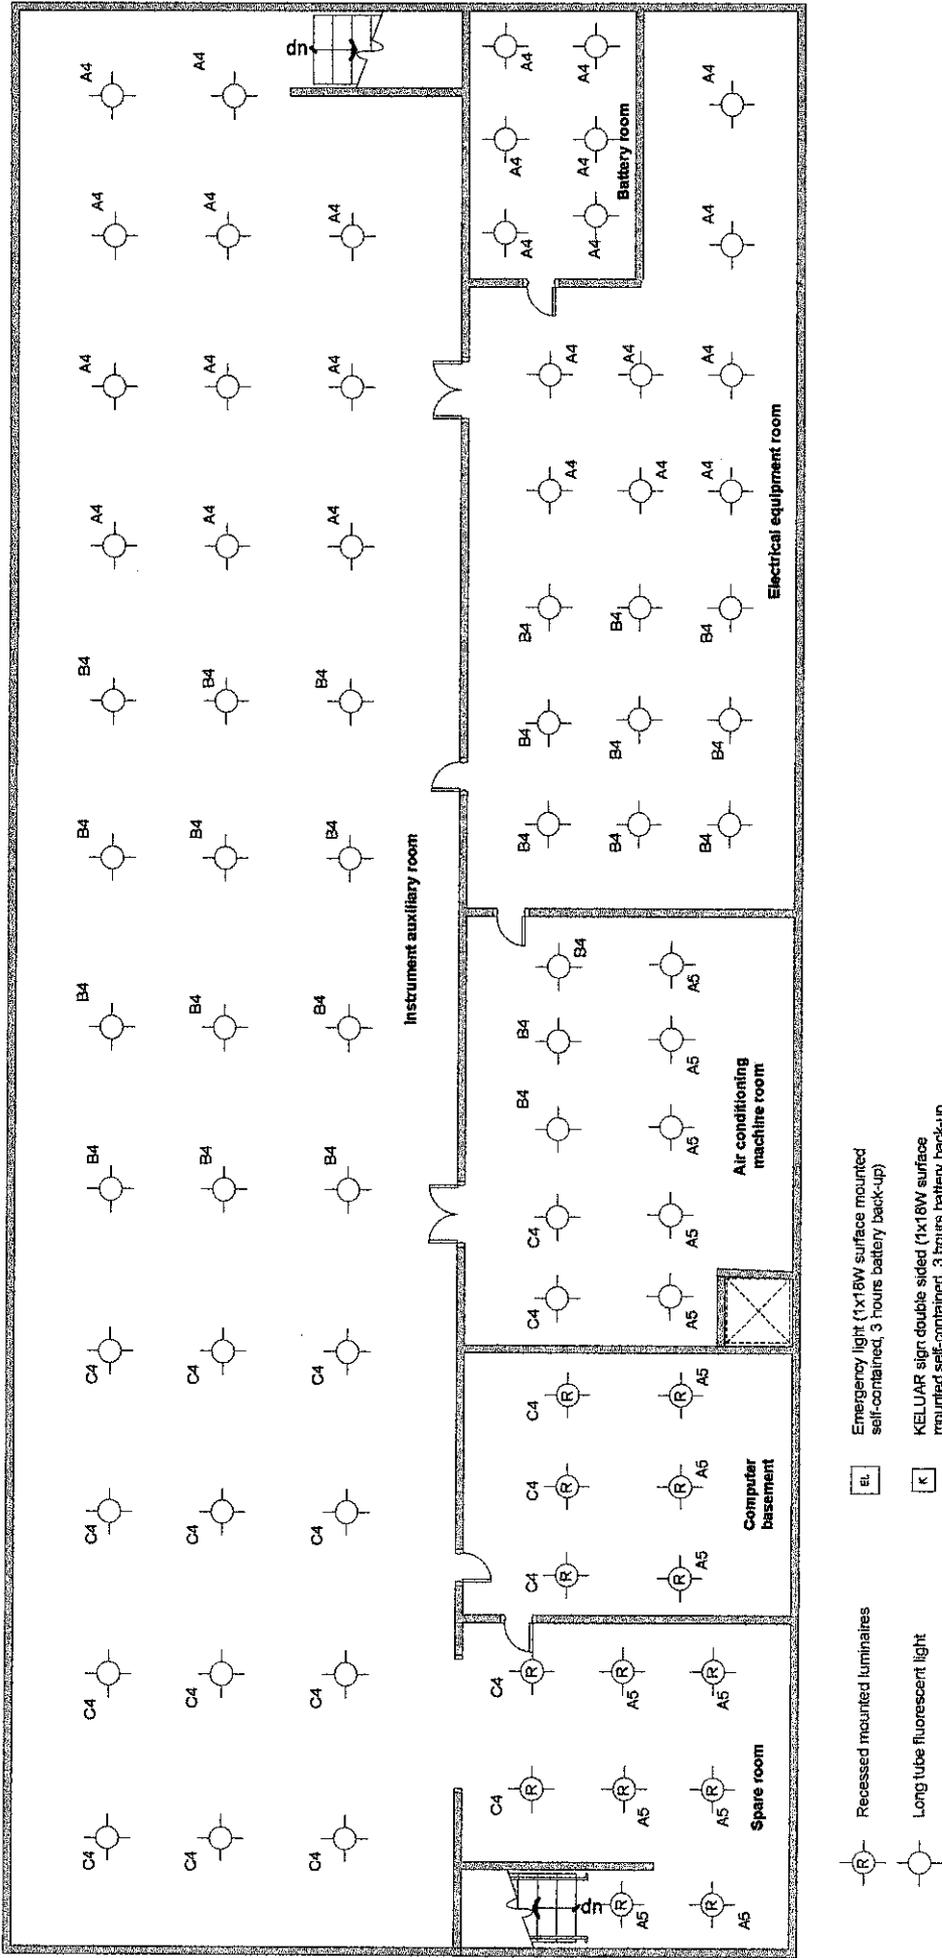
Basement of the building with normal lighting and emergency lighting fixtures arrangement
